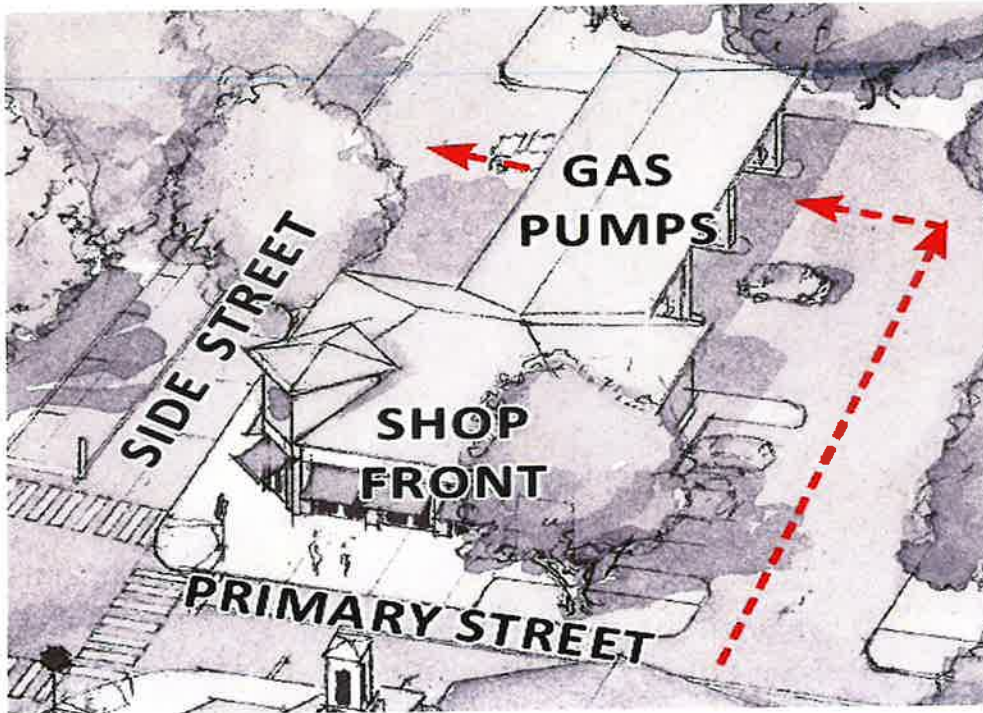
Service station examples of pumps to the side of the building
